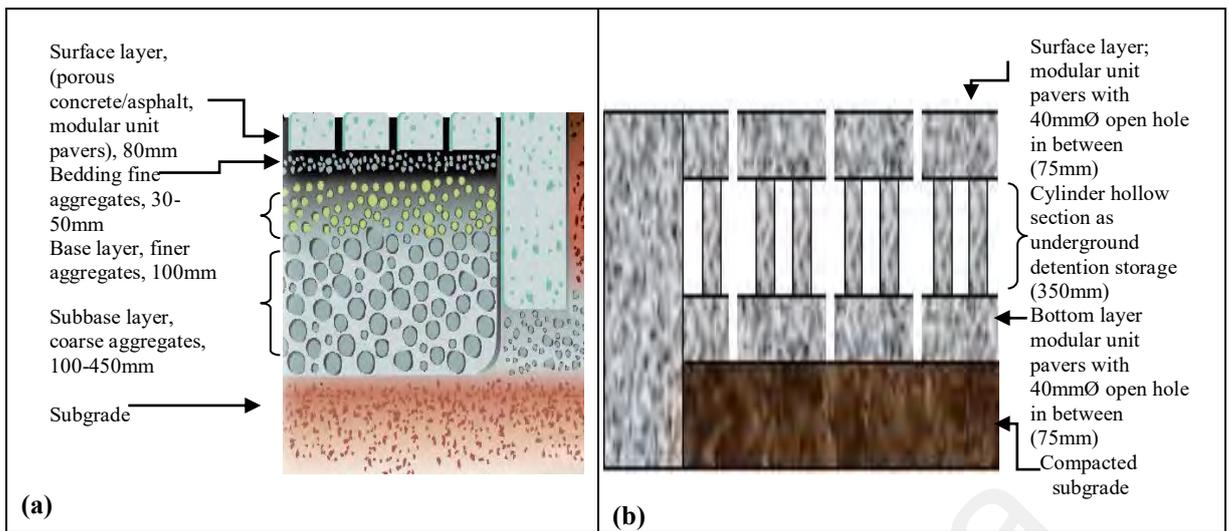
Cross-section design of (a) typical permeable pavement, and (b) suggested PPDS
